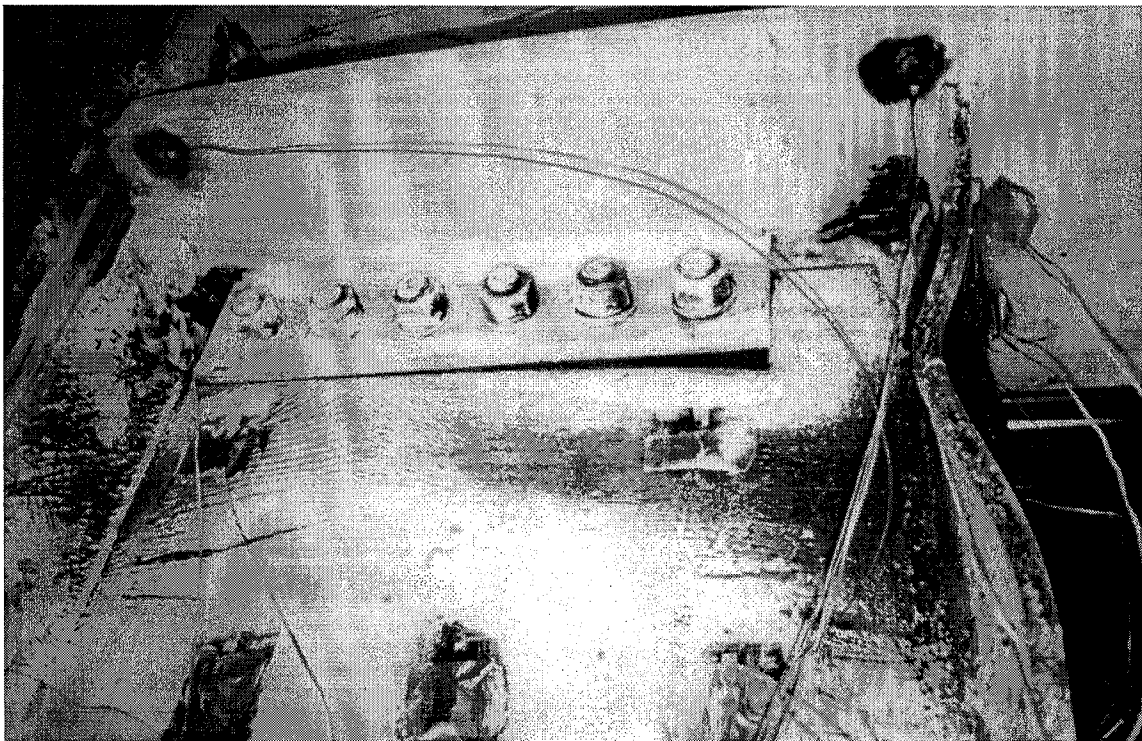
SW Connection Region (West Girder of Specimen 3)
